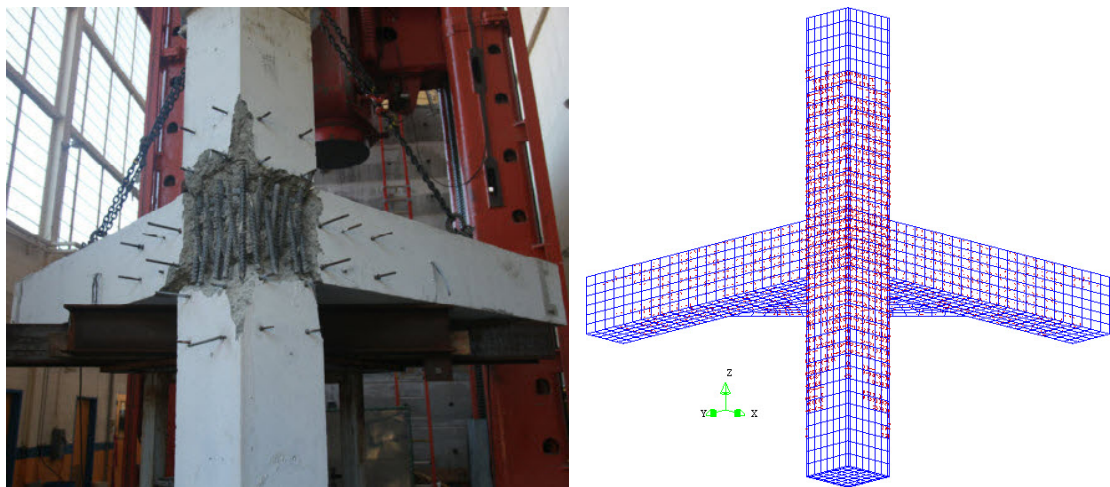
YZ-Face Joint Crack Pattern Prior to Failure for Park Specimen
